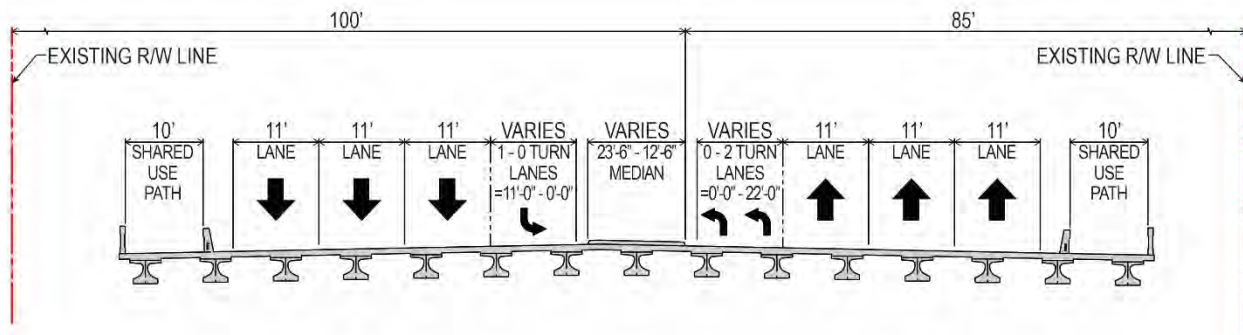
Proposed Typical Section for the Tomoka River Bridge
